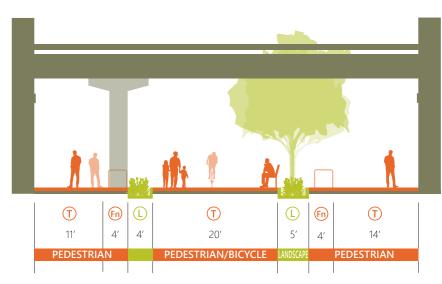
Existing conditions, section, Montgomery between Broadway and Park Avenues.
